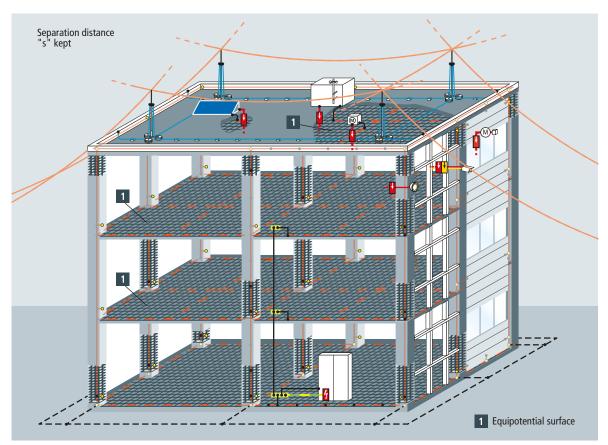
Multi-storey building with equipotential surfaces including air-termination system
